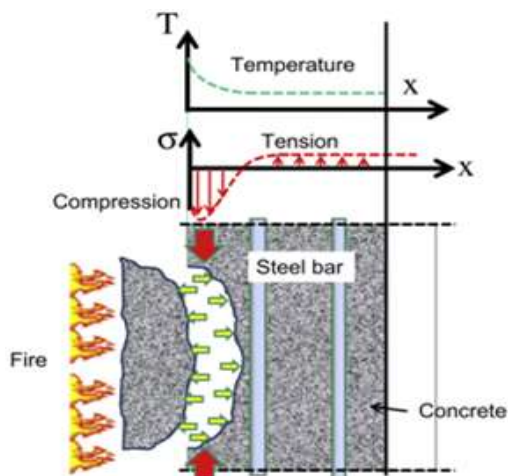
Spalling mechanism: thermal dilation.
